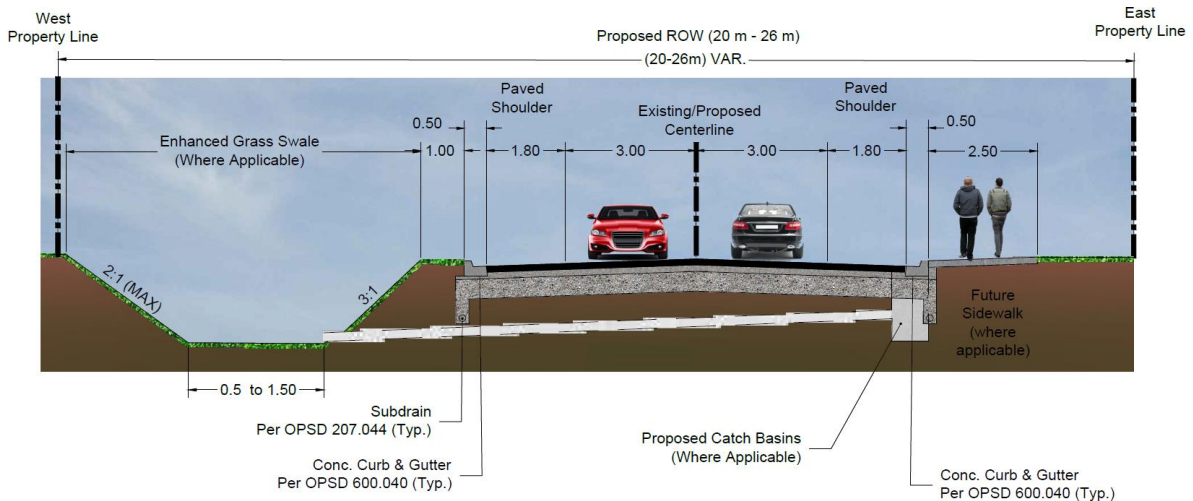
Typical Urban Cross Section with enhanced grass swale
